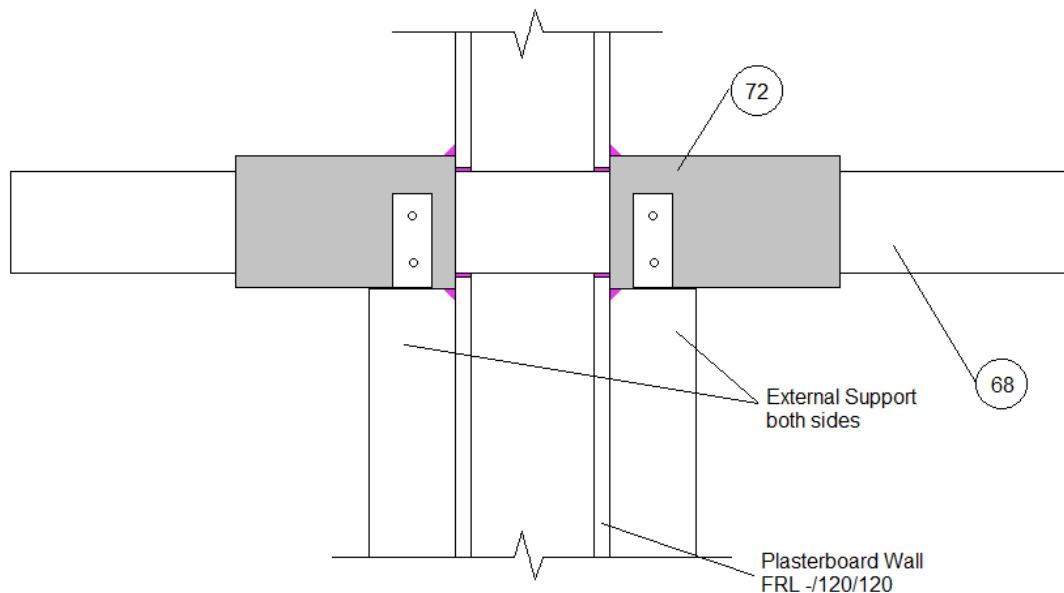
Insulated C or Z-purlin/I-beam through Plasterboard Wall Construction- Case B
